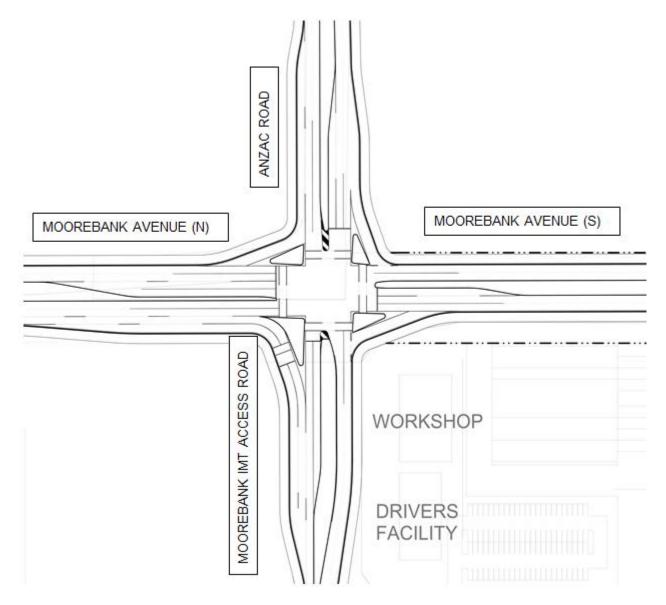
Proposed Moorebank Avenue, Anzac Road and Moorebank IMT Access intersection
